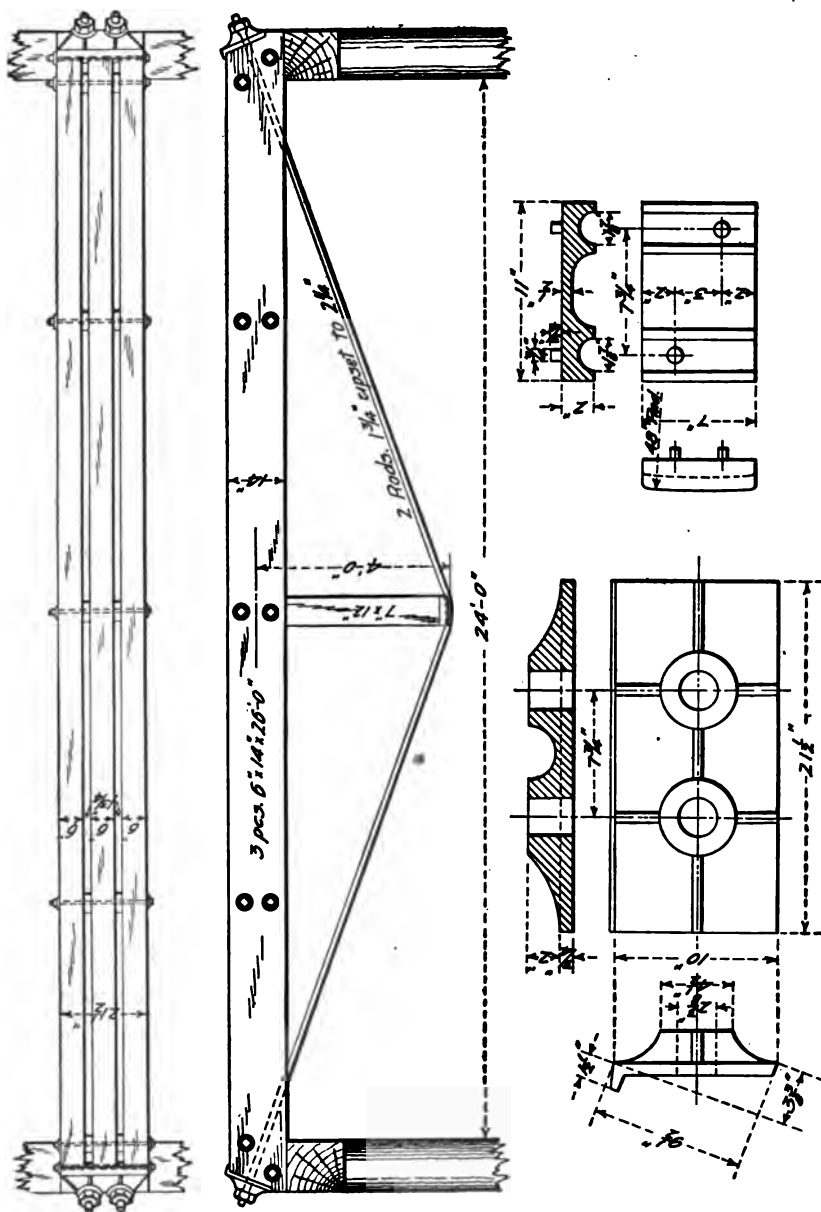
Trussed Beam on One Side of a Railroad Beam Bridge.
